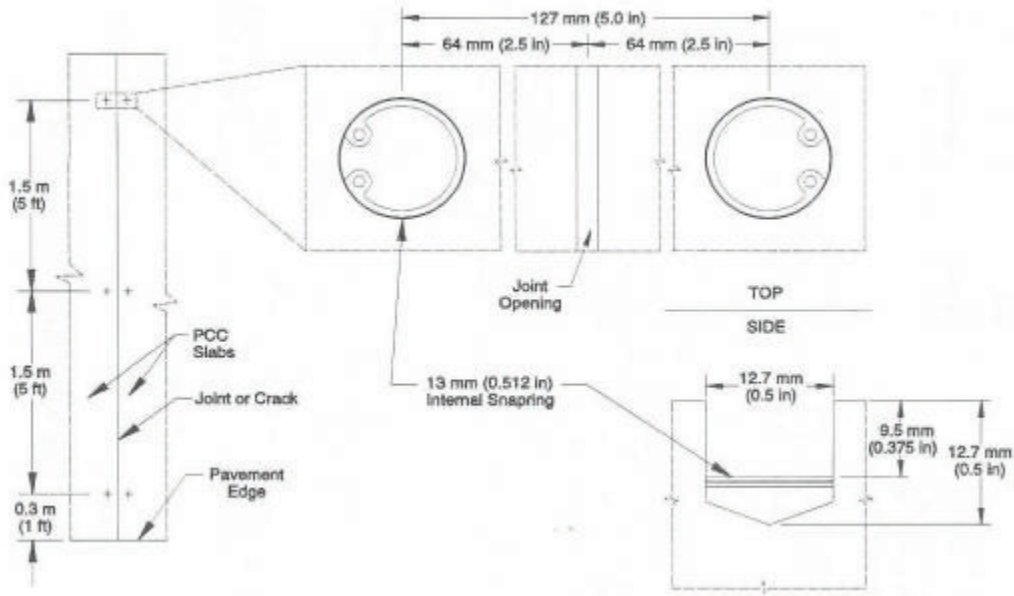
Schematic of a snap ring testing set up across a joint in a concrete pavement.
